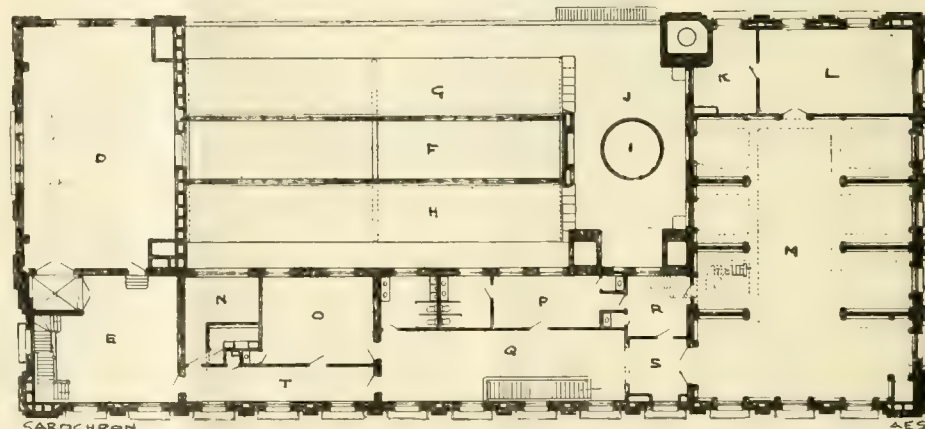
BOSTON HORTICULTURAL HALL: SECOND-FLOOR PLAN. (SEE P. 95.)
